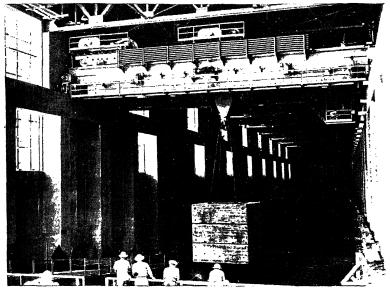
Three-hundred-fifty-ton electric traveling crane under test at Grand Coulee Dam, Washington. Concrete blocks suspended from the main hook weigh 219 tons. These cranes are used for installation and servicing of the heavy equipment. (Whiting.)
